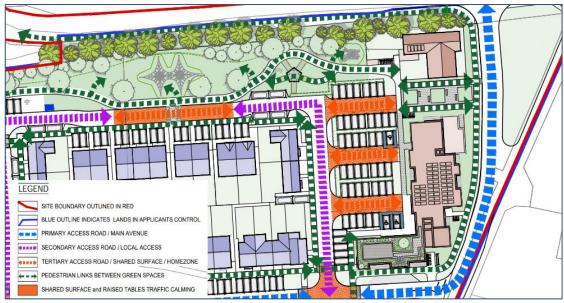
Connections to Rosshill Road and Rosshill Stud Farm Road – extract of drawing 20175-3020
